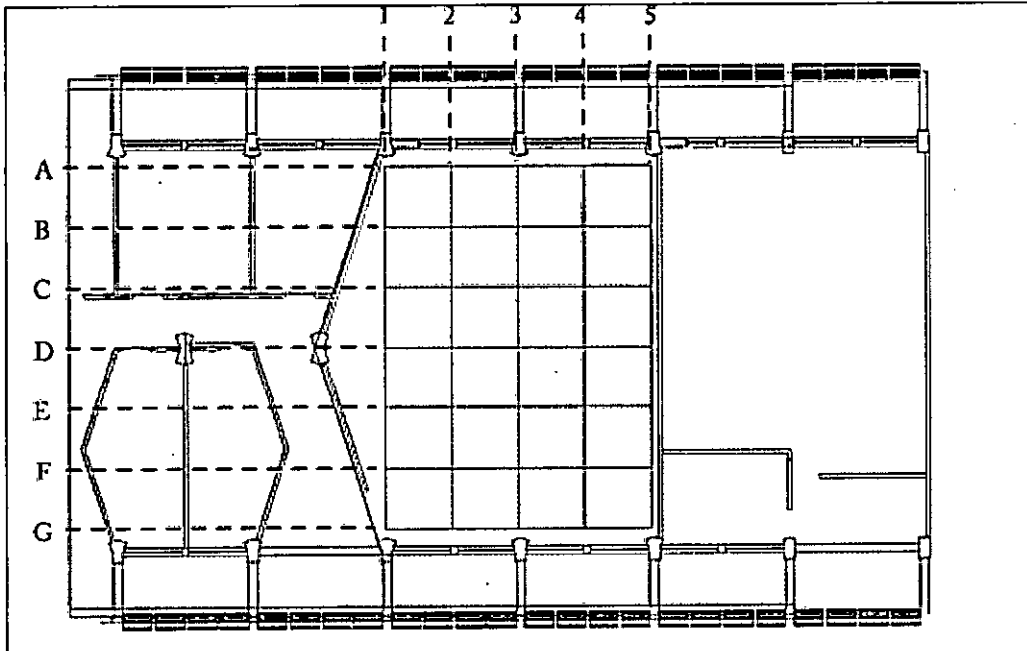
(a): Plan showing the grids and codes of the intersection points of the Example Space,
